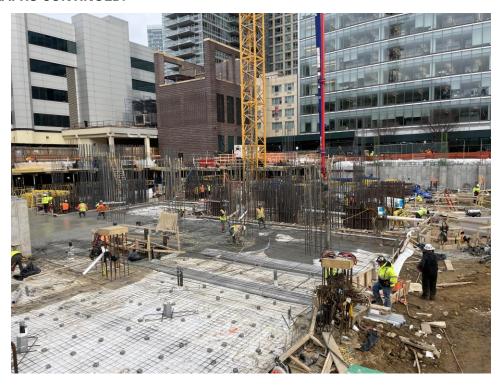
ECD pouring concrete for foundation slab in the western part of the site (facing northeast).
